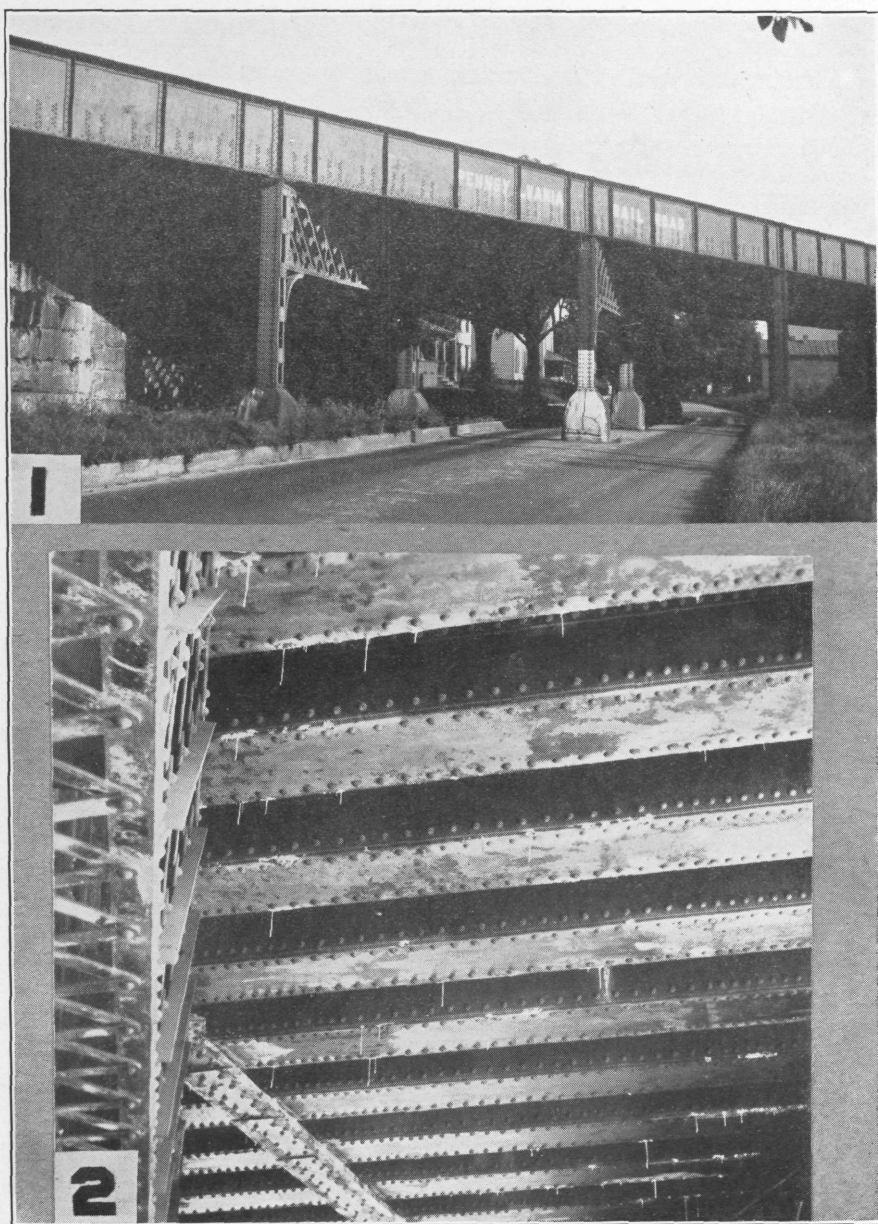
Railroad bridge crossing Bever Street, Wooster, Ohio.
